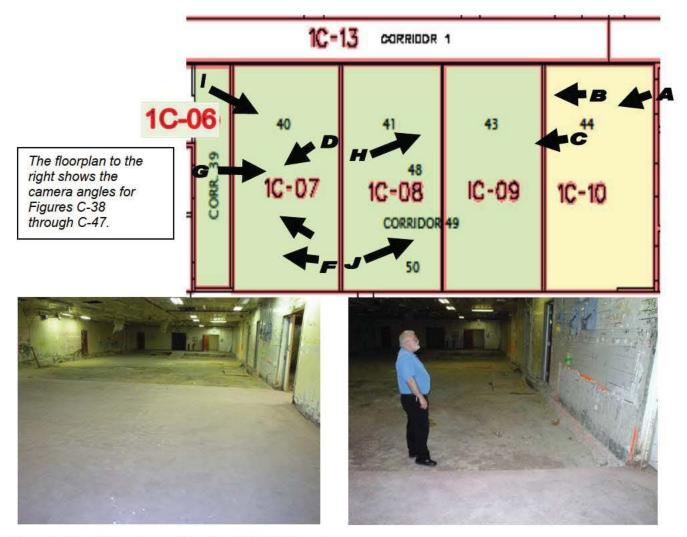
T Bldg. Rooms 39–44 and 48–50 View A. Figure C-39. T Bldg. Rooms 39–44 and 48–50 View B.
